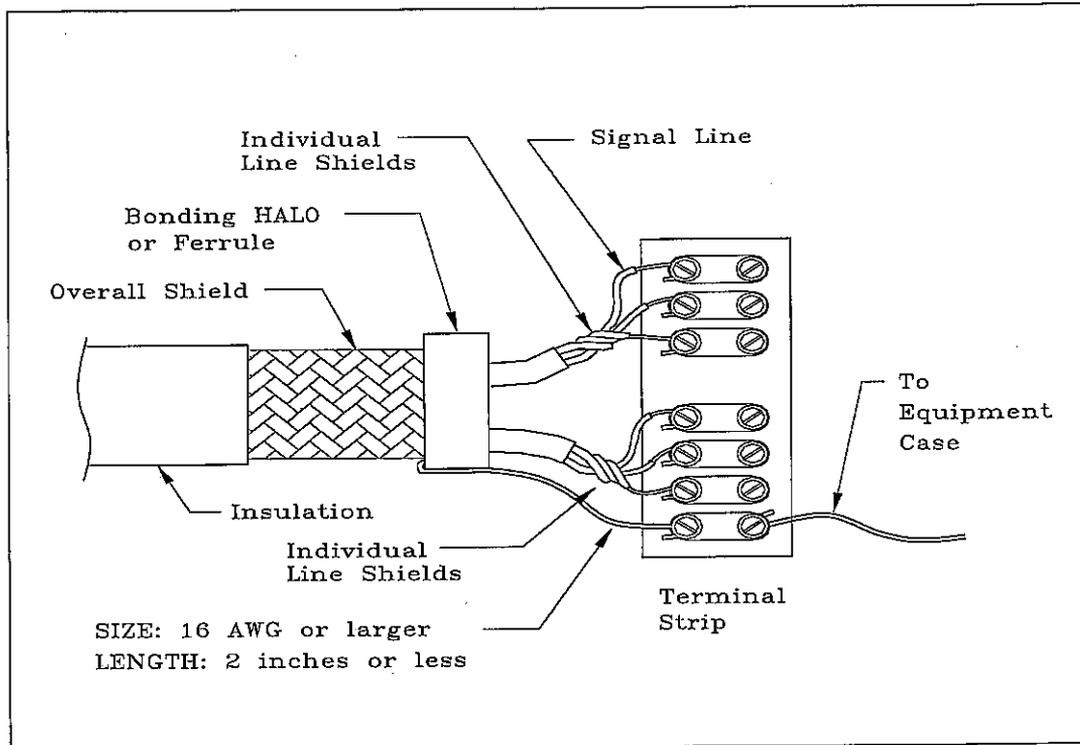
Figure IV. Grounding of Overall Cable Shield to Terminal Strip
